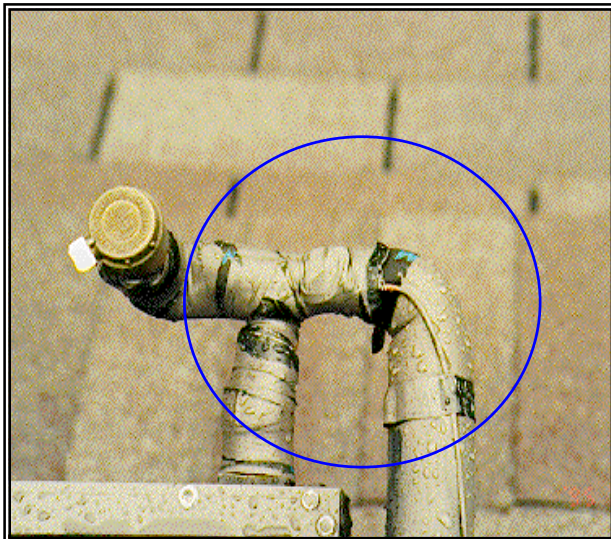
Sections of insulation and sensor wiring have not been protected from ultraviolet rays.
